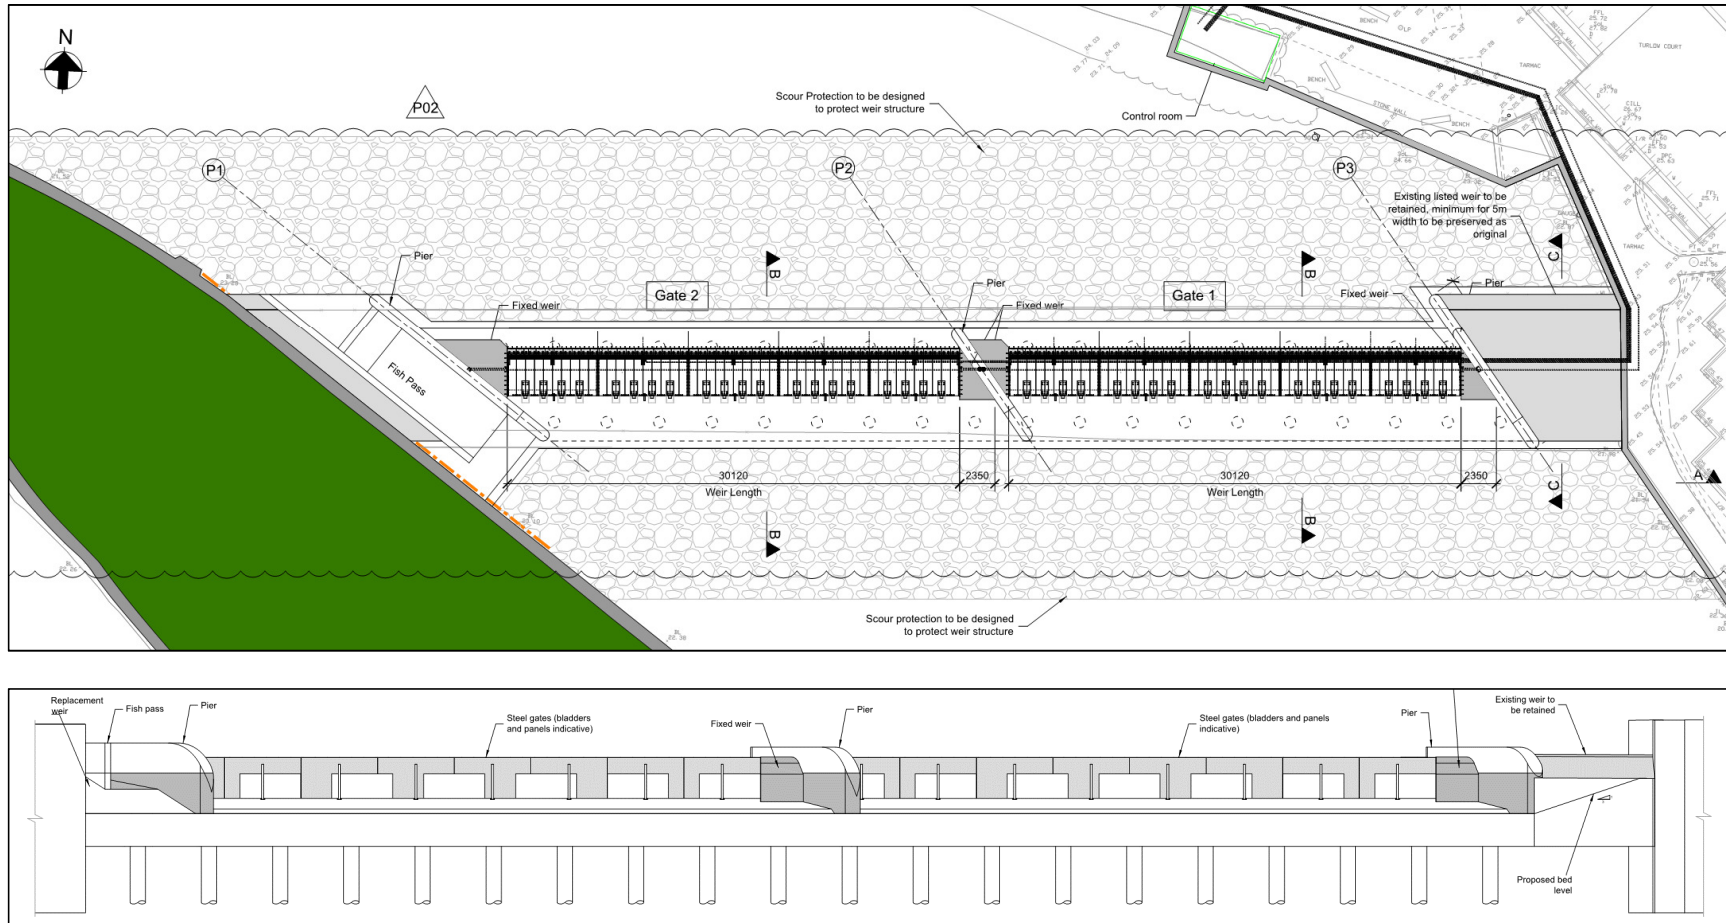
and 3: Plan and front elevation of proposed movable weir at Crown Point
